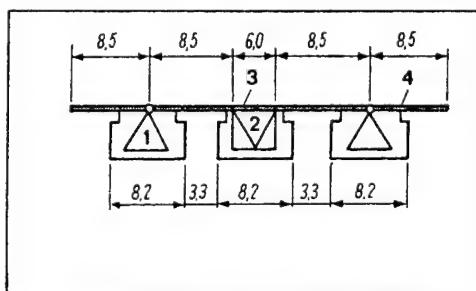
Construction Elements of the Ship Bridge Building Equipment 66 (dimensions in meters)
